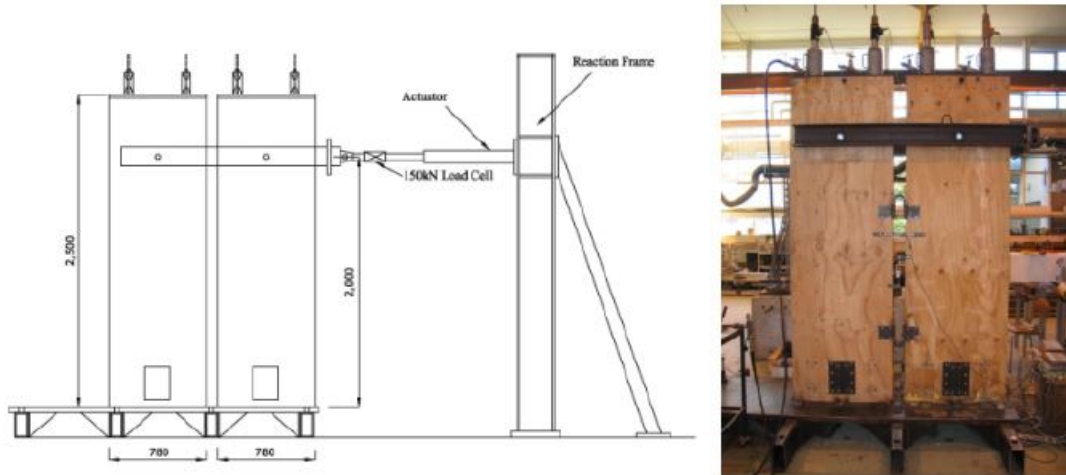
UFP Coupled Wall-to-Foundation Test from [Iqbal et al., 2007]
